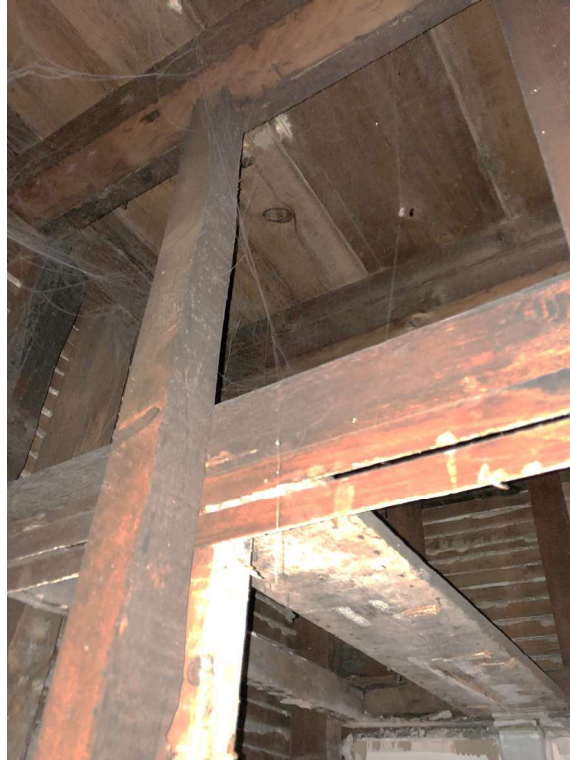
Image of interior foundation of Porters House during interior work, showing timber framing style (Provided by applicant)
